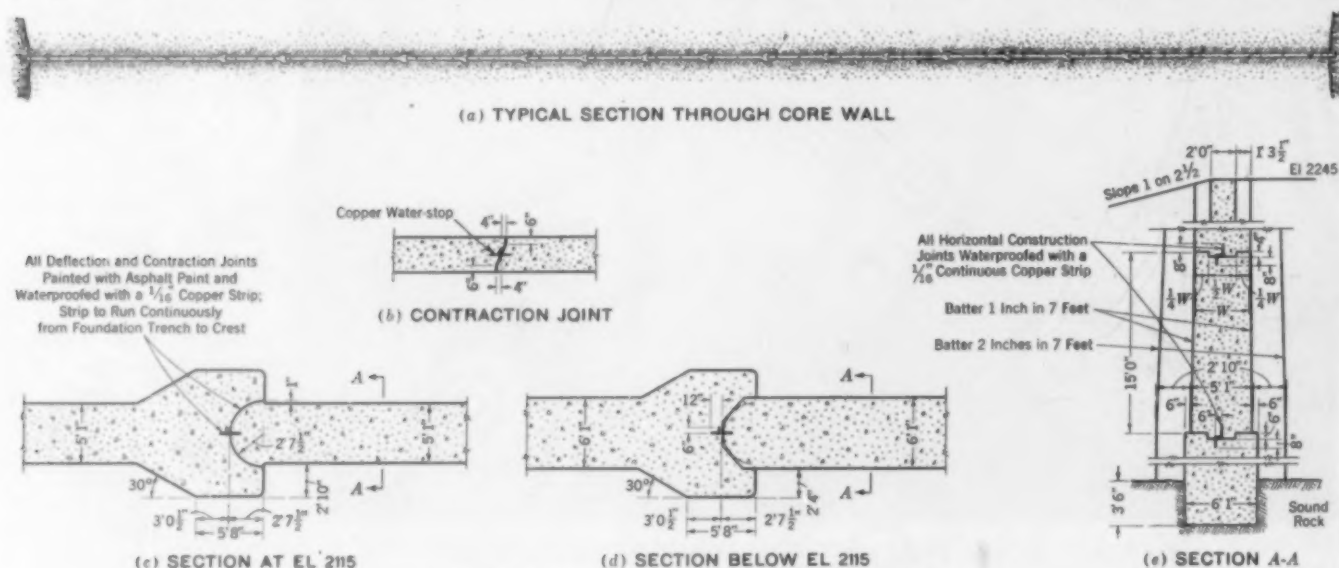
DETAILS OF ARTICULATED CORE WALL
